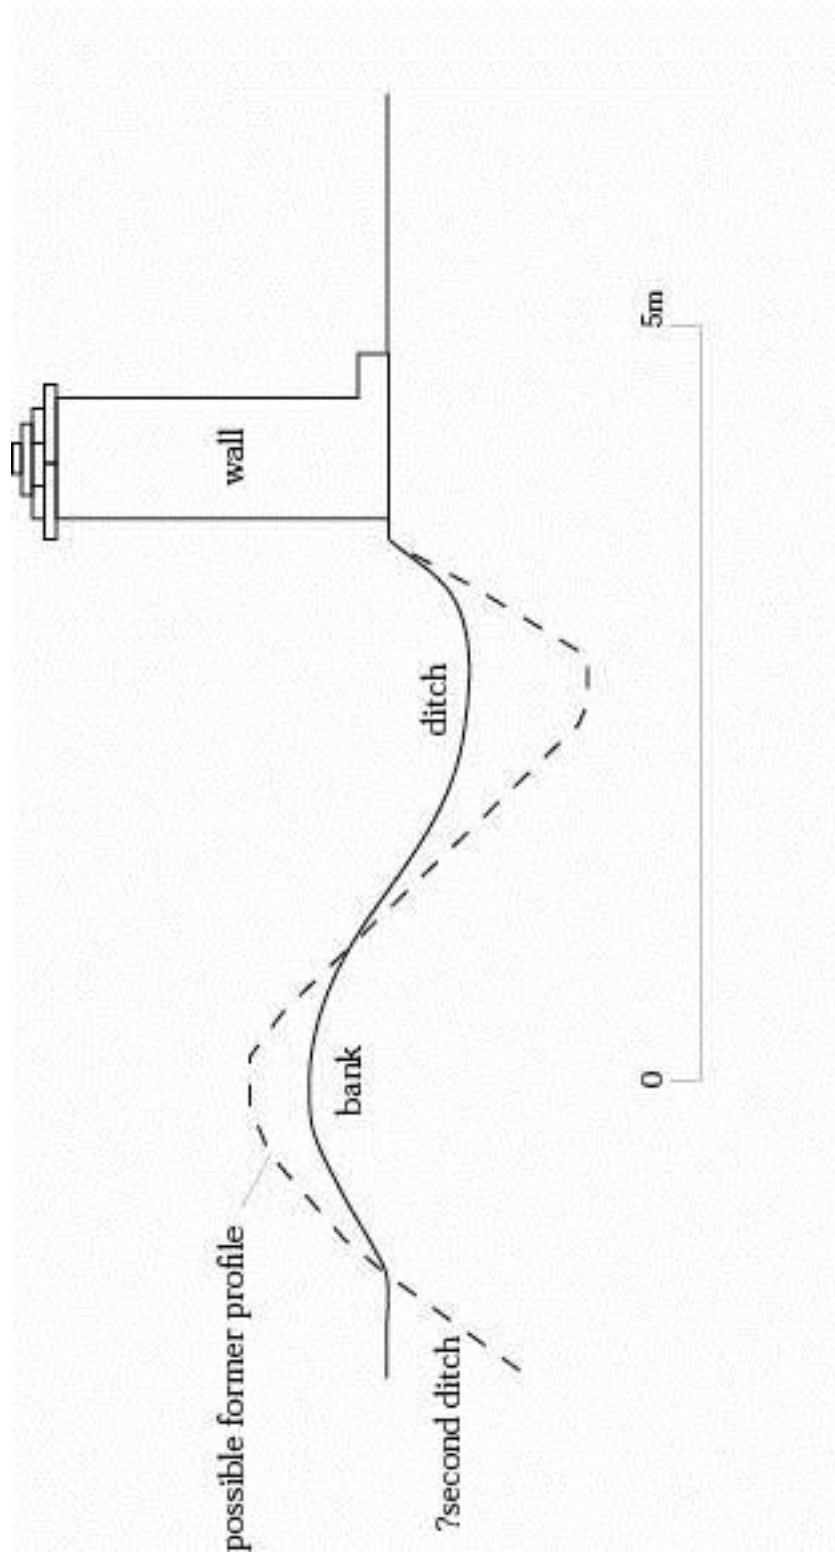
Profile of present earthwork bank and ditch inside the deer park wall, showing possible former profile.
